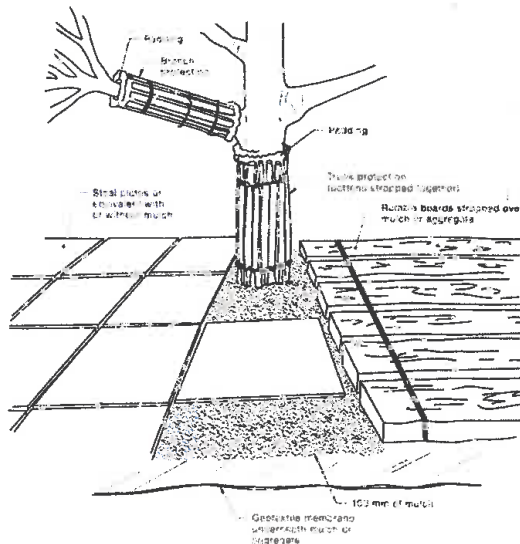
Indicative detail of ground protection - from AS4970-2009 Protection of Trees on Development Sites, p.17
